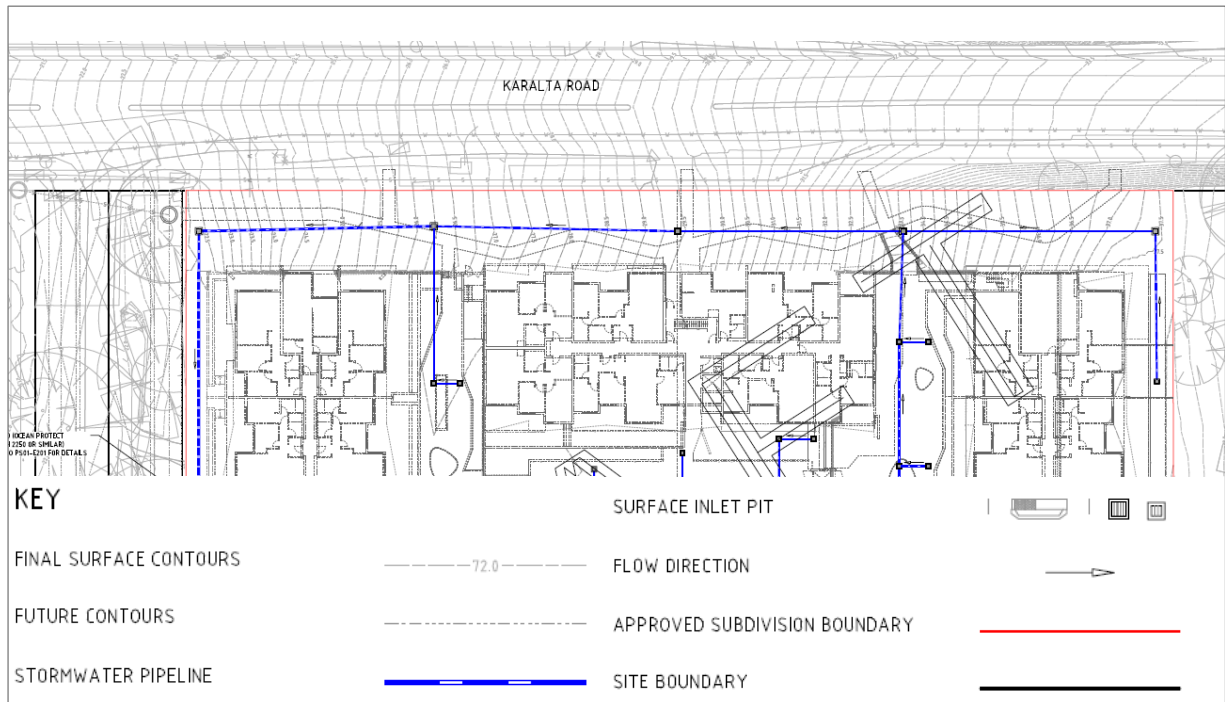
Drainage Plan Ground Floor - PS01-E100 Rev D
